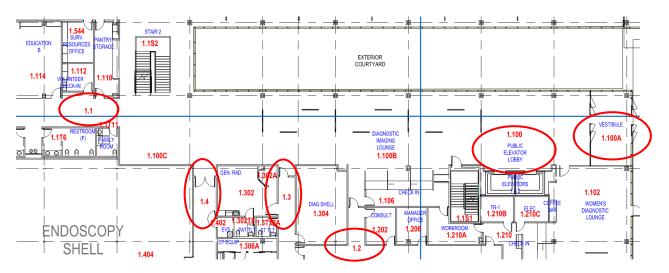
New Building and Major Renovation: Example showing main elevator lobby and corridor numbering.
